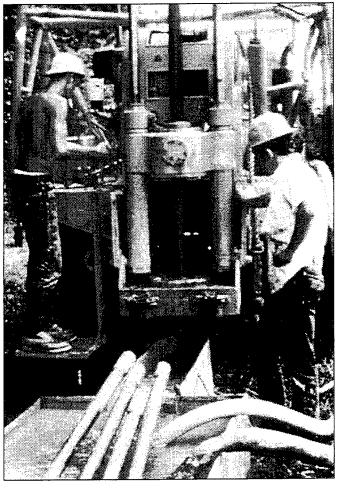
(b) Typical Equipment and Set-up of Rotary Wash Drilling. (Note Mud Pit in the Foreground in the lower Photograph).
